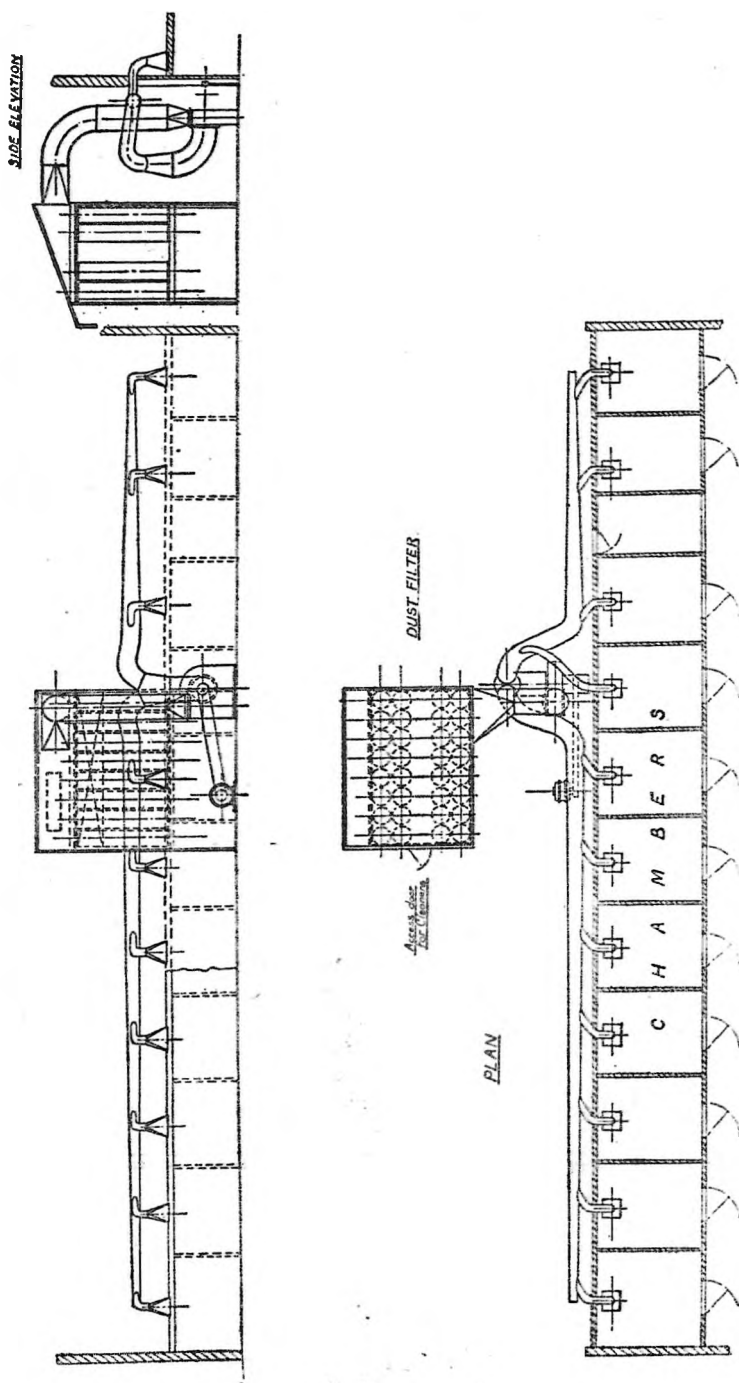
EXHAUST AT DISINTEGRATOR CHAMBERS.
